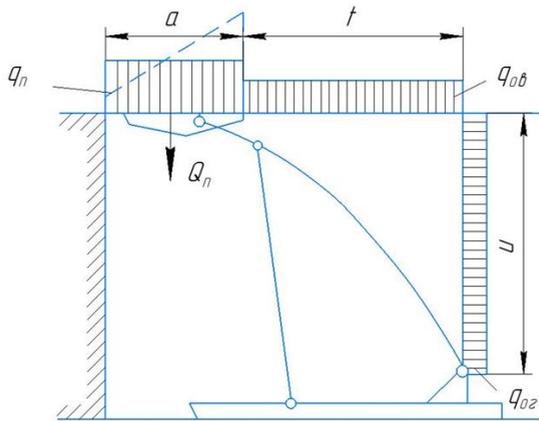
Loads on the supporting and protective elements of the protective and supporting supports
